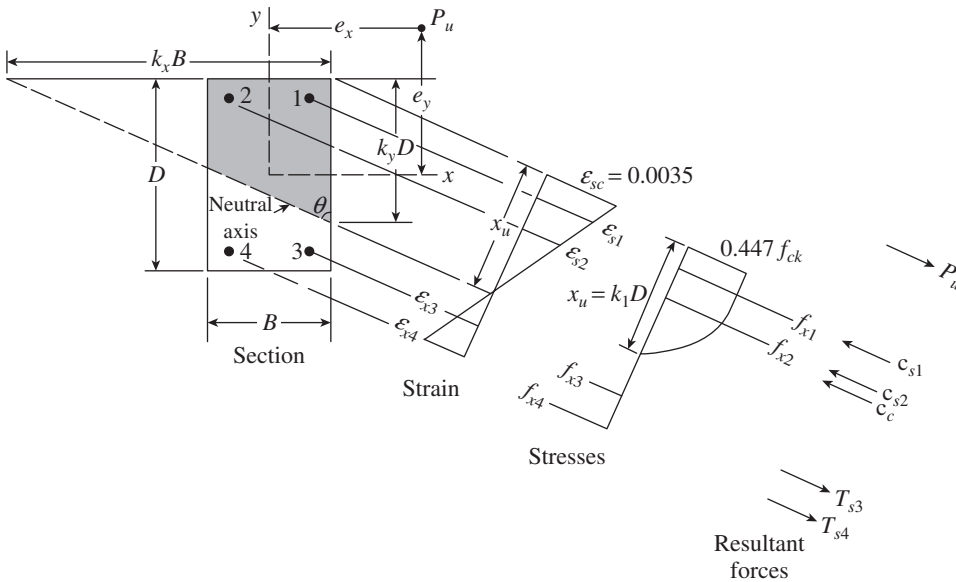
Biaxial bending of symmetrically reinforced concrete columns
